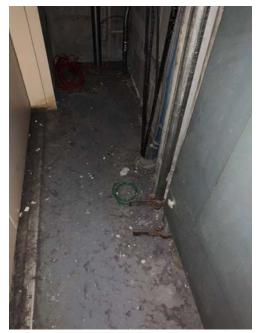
& 16: Asbestos-Containing Spray On Fireproofing Debris on Floor, Conduit and Walls – Ground Floor – 7th Floor (Electrical Closets)
